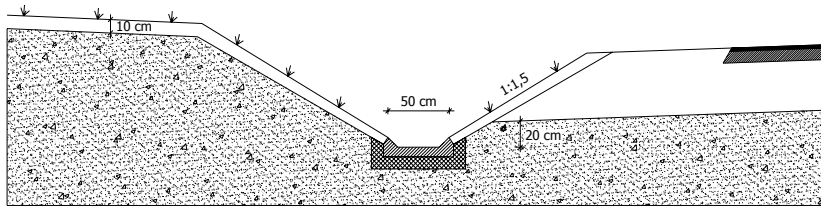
Trapezoidal ditch with a smooth bottom (precast concrete element) for longitudinal falls of  $J < 0.3\%$
